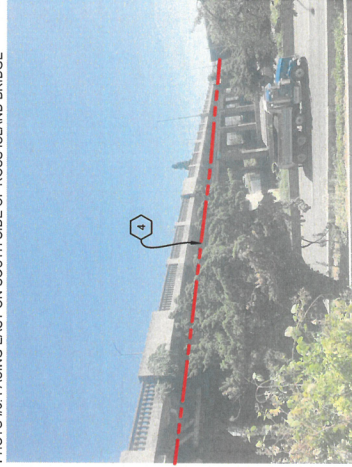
FACING EAST ON SOUTH SIDE OF ROSS ISLAND BRIDGE ON SW MOODY AVE.
